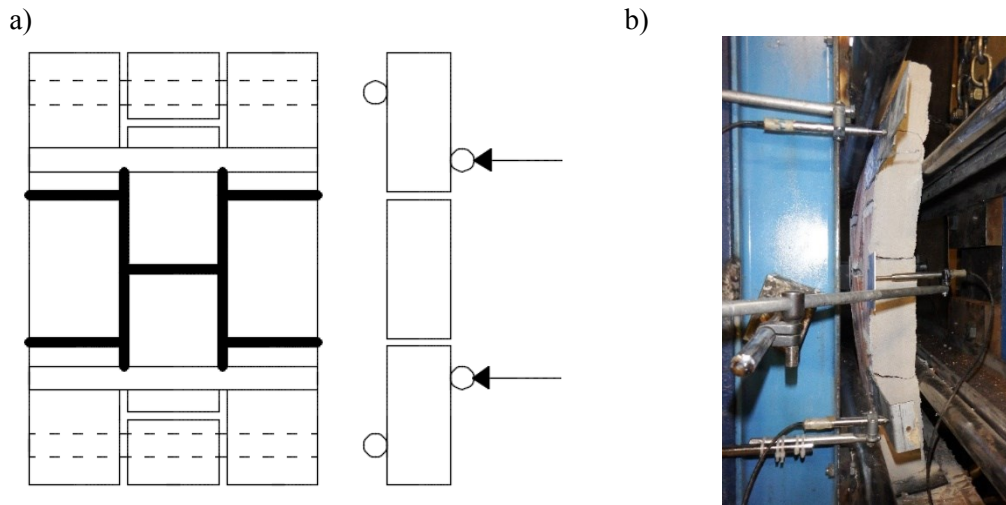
a)Cracking pattern of the specimens and b)its deformation in flexural test perpendicular to the bed joints
